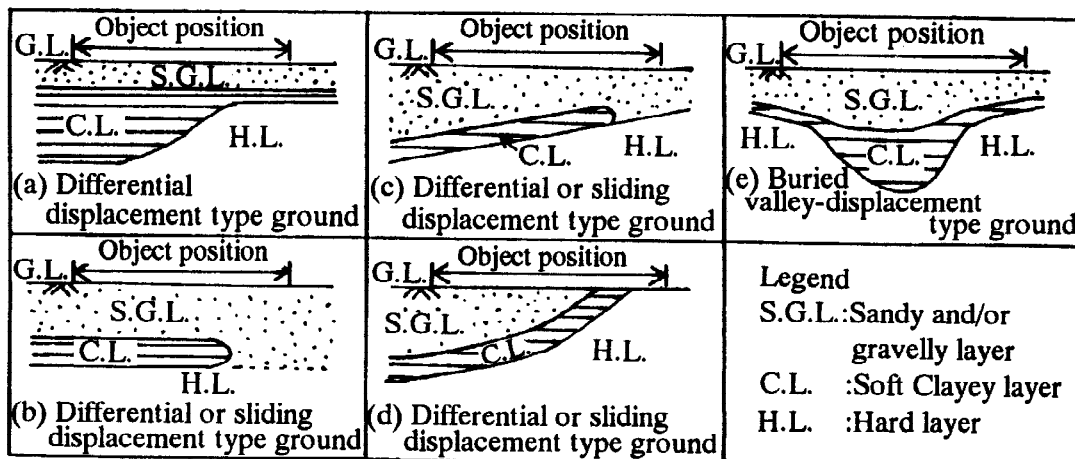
The structures of grounds liable to induce damage to objects due to earthquake (Objects show embankments, buildings, bridges and so on.)
